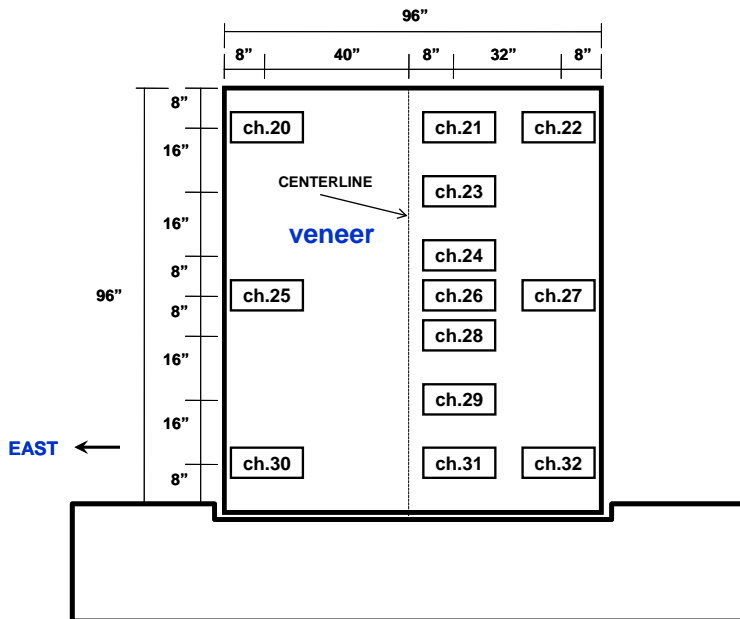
Instrumentation of quasi-static, out-of-plane CMU wall specimens (vener side)
